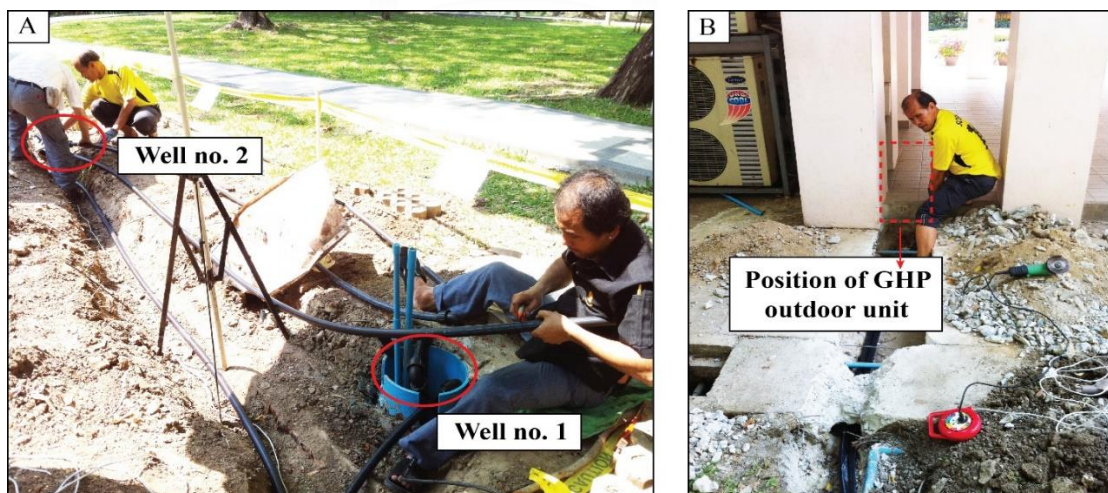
(A) Connecting HDPE pipe of well no.1 to HDPE pipe of well no.2 (Mr. Surachat Wachipokcharoen, tall 169 centimeters) (B) Preparing HDPE of well nos.1&2 for connect to GHP outdoor unit.
